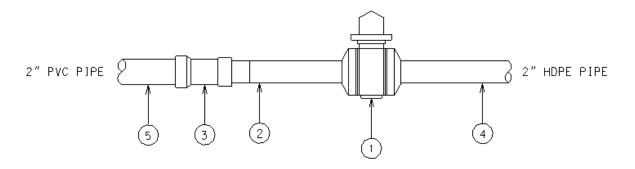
b: Main Connection – 2 inch HDPE to 2 inch PVC
